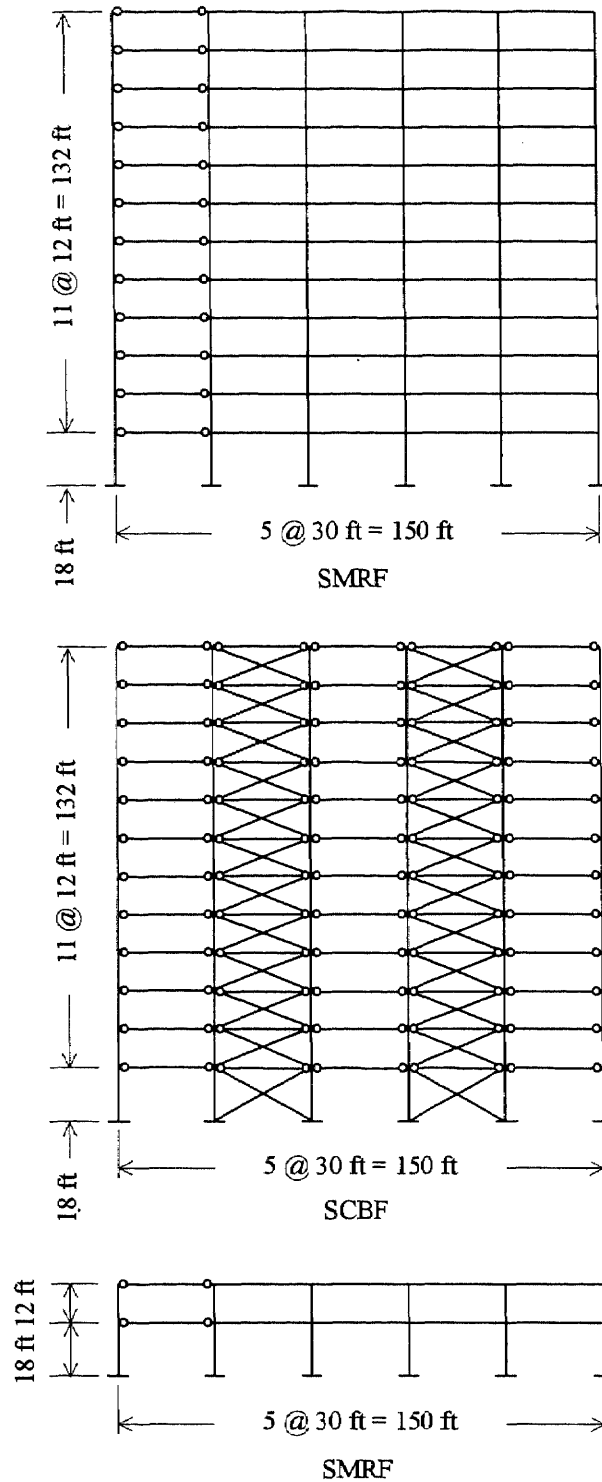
Configuration layout of the perimeter lateral-force-resisting frames.
